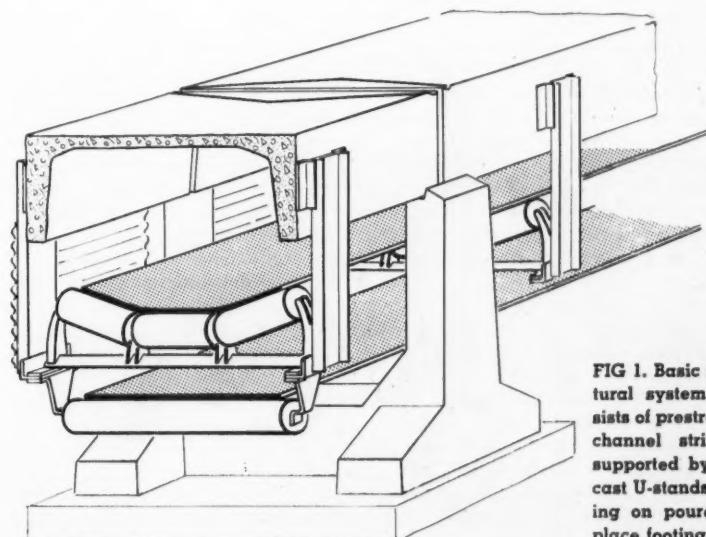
Basic structural system consists of prestressed channel stringers supported by precast U-stands resting on poured-in-place footings.
